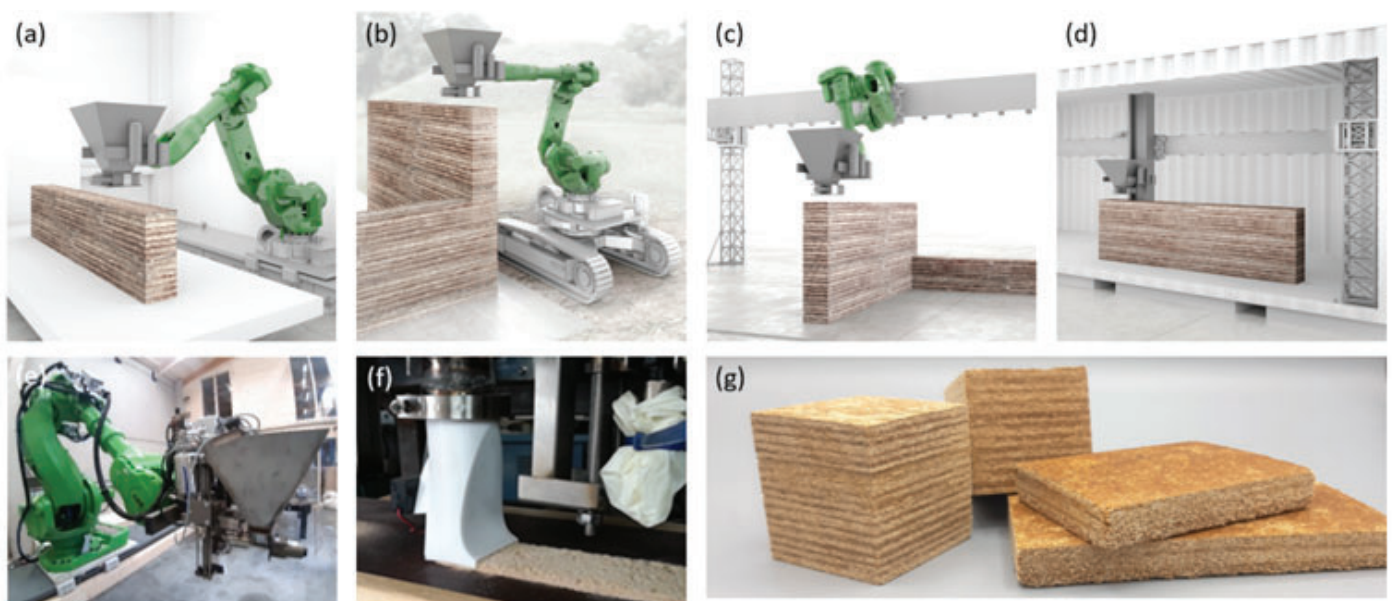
(a)-(d) Possible carrier systems and construction strategies; (e) First prototype of the print head mounted on the 6-axis ABB robot at BOKU; (f) Printing nozzle allowing for a continuous and constant layer of the printing material; (g) Specimens produced and formatted for the material tests.
